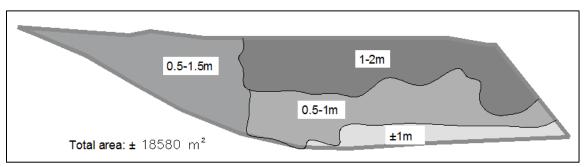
Schematic map of the ground elevation of the existing terminal [17].
